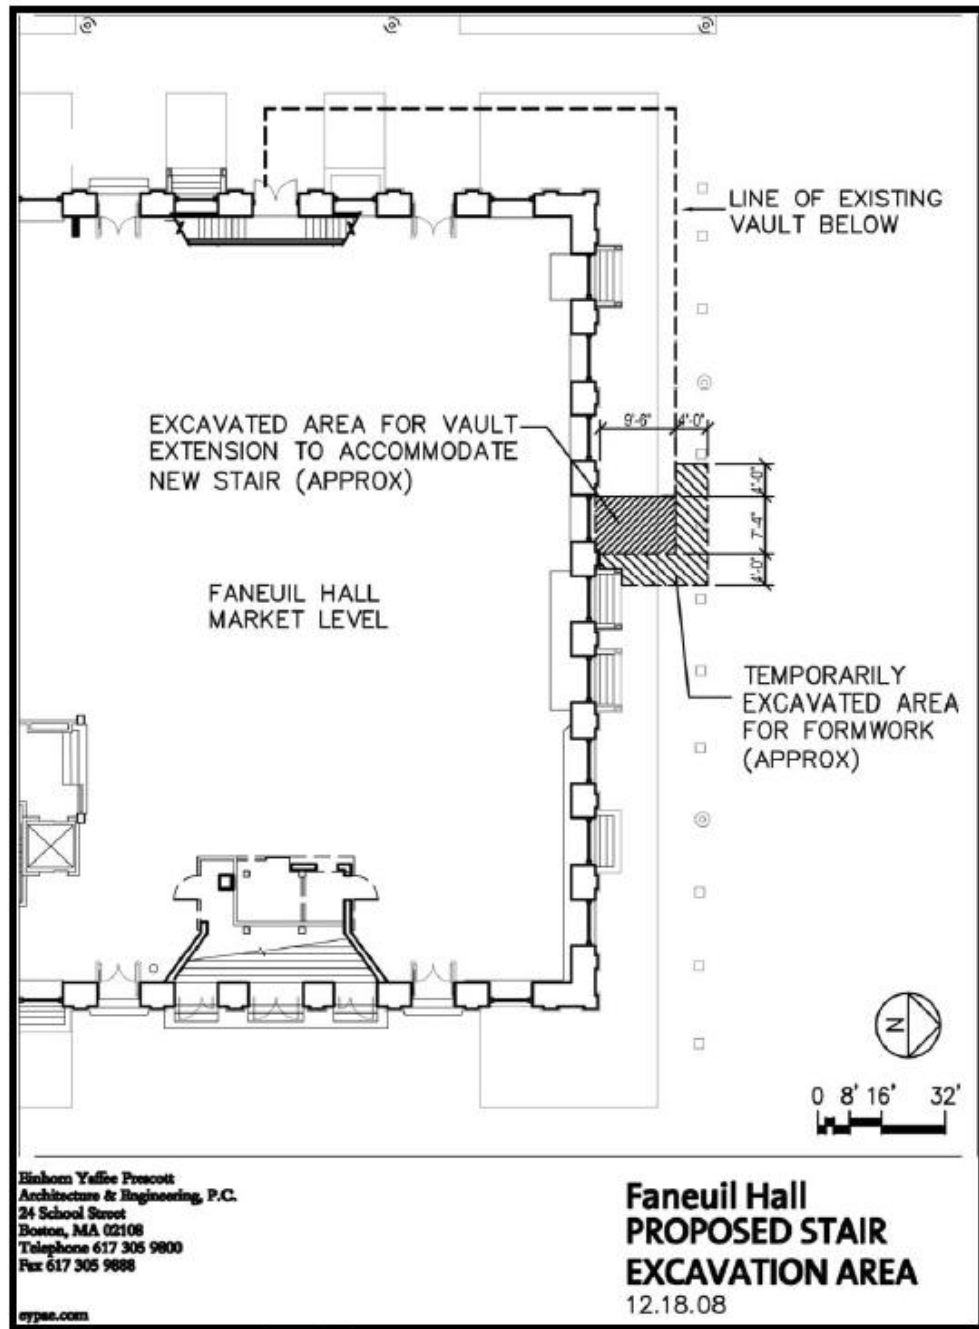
Approximate size and location of excavation unit on the North side of Faneuil Hall.
